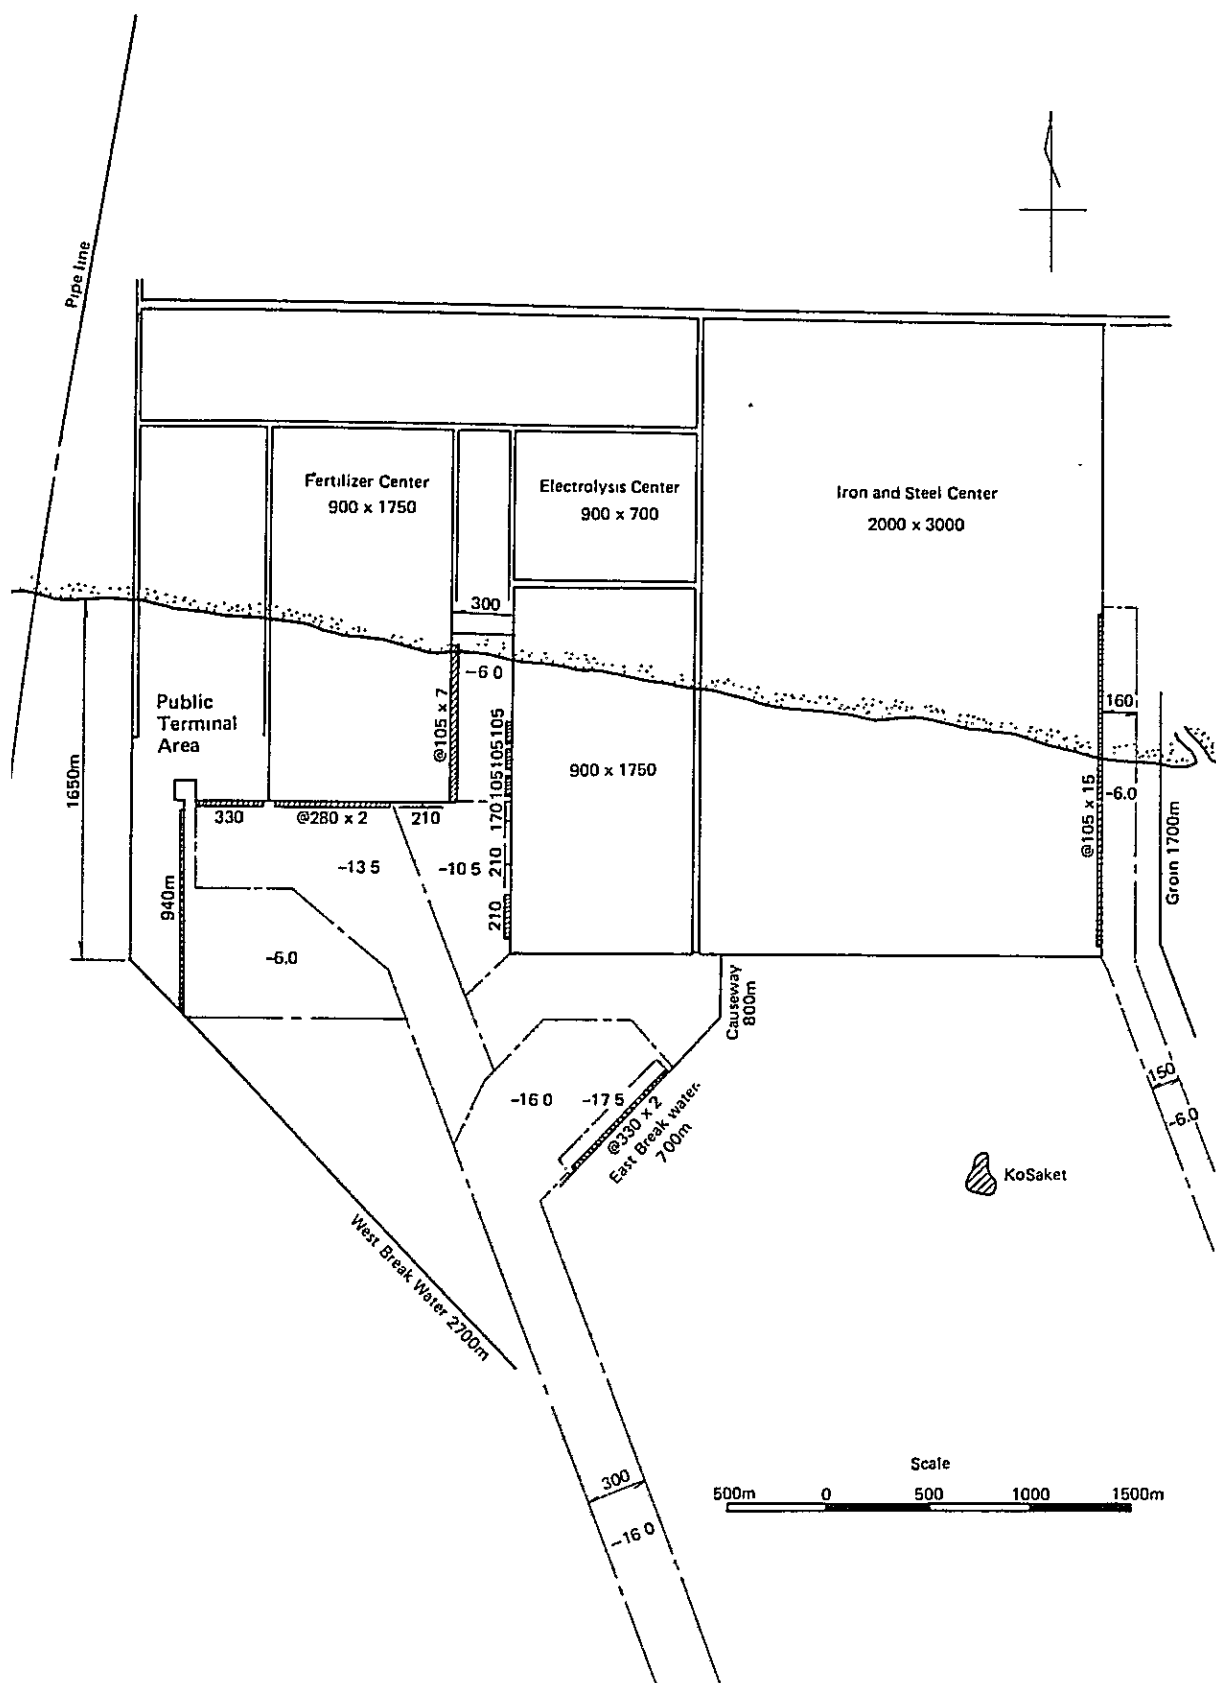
Berth Arrangement [Reclaimed Type]
